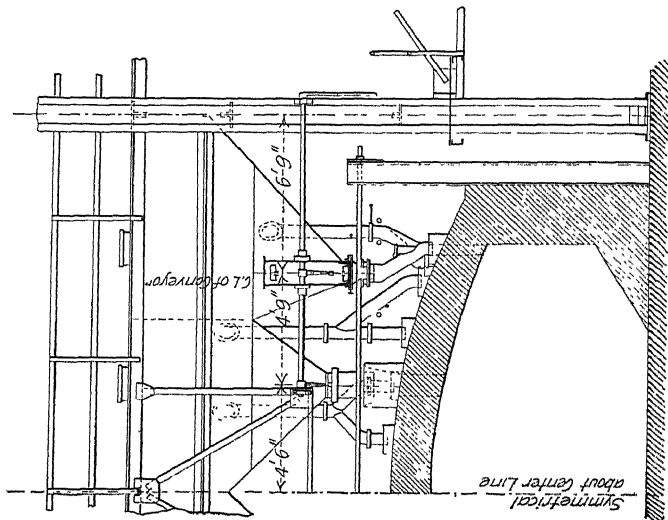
SECTION REVERBERATORY FURNACE SHOWING CHARGING ARRANGEMENT.
